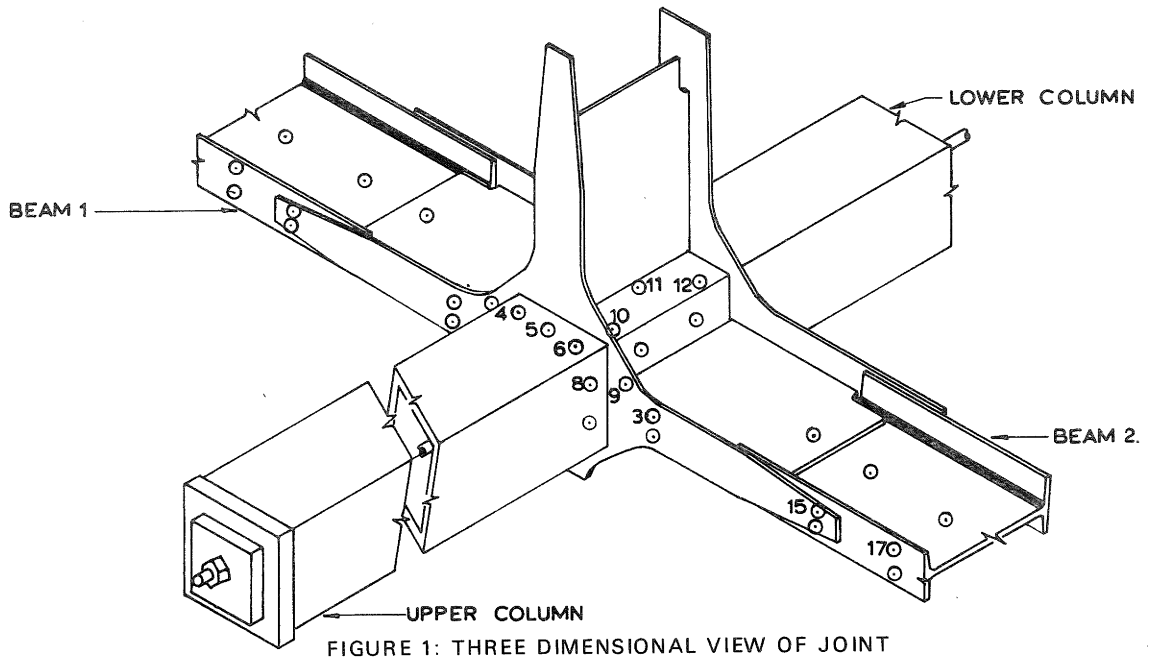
THREE DIMENSIONAL VIEW OF JOINT
